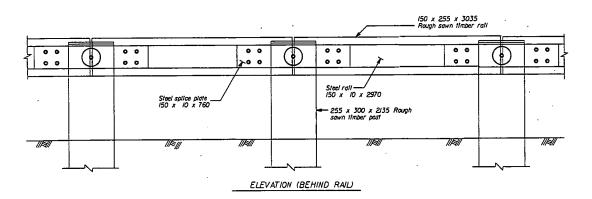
Steel-backed timber guardrail without blockout— Colonial Parkway, Virginia.
